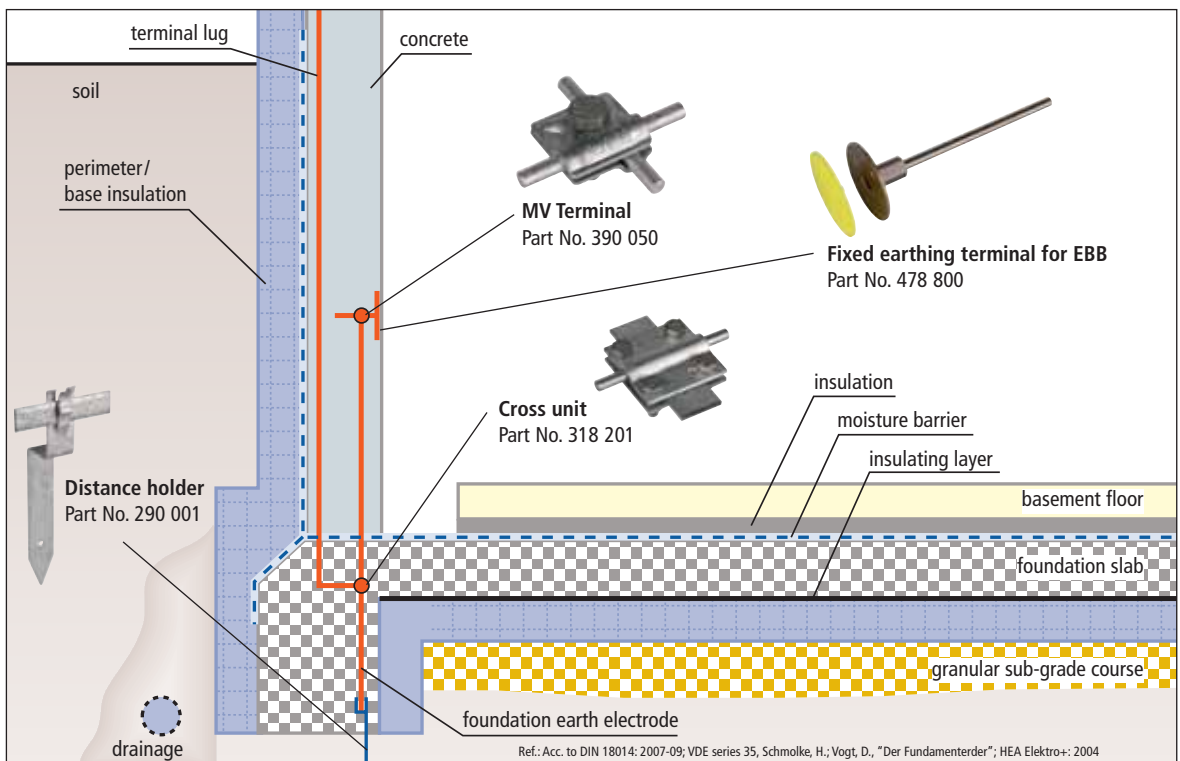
Arrangement of a foundation earth electrode in a strip foundation (insulated basement wall and foundation slab)
